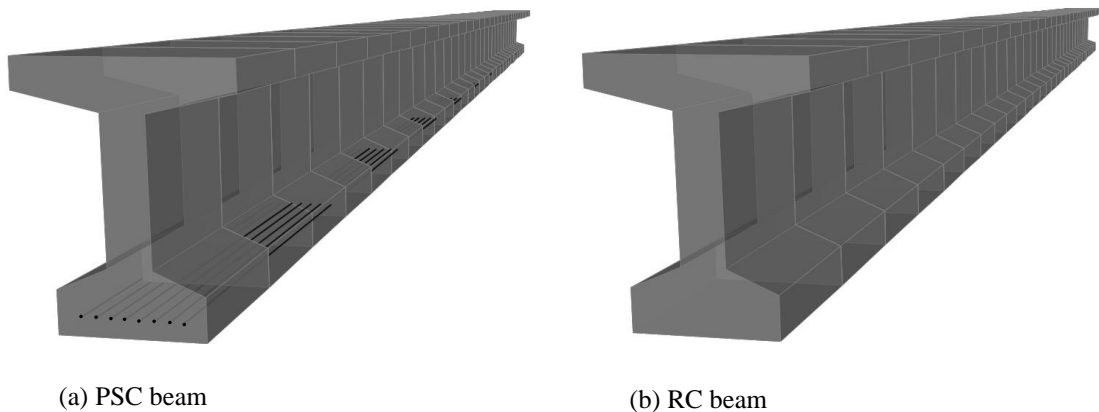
Finite element model of (a) PSC beam and (b) RC beam
